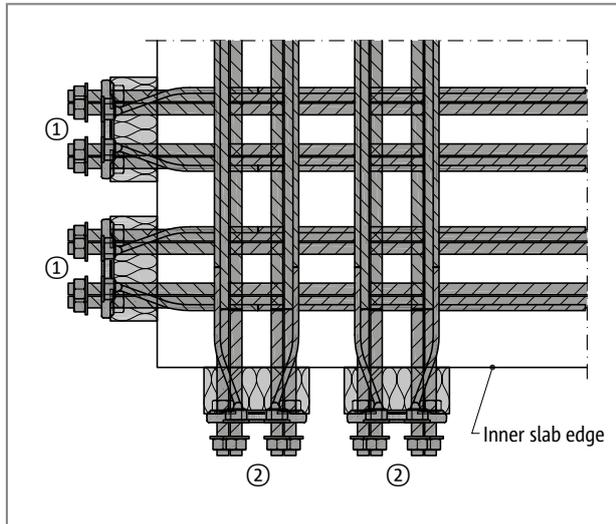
Schöck Isokorb® T type SK: Outer corner
